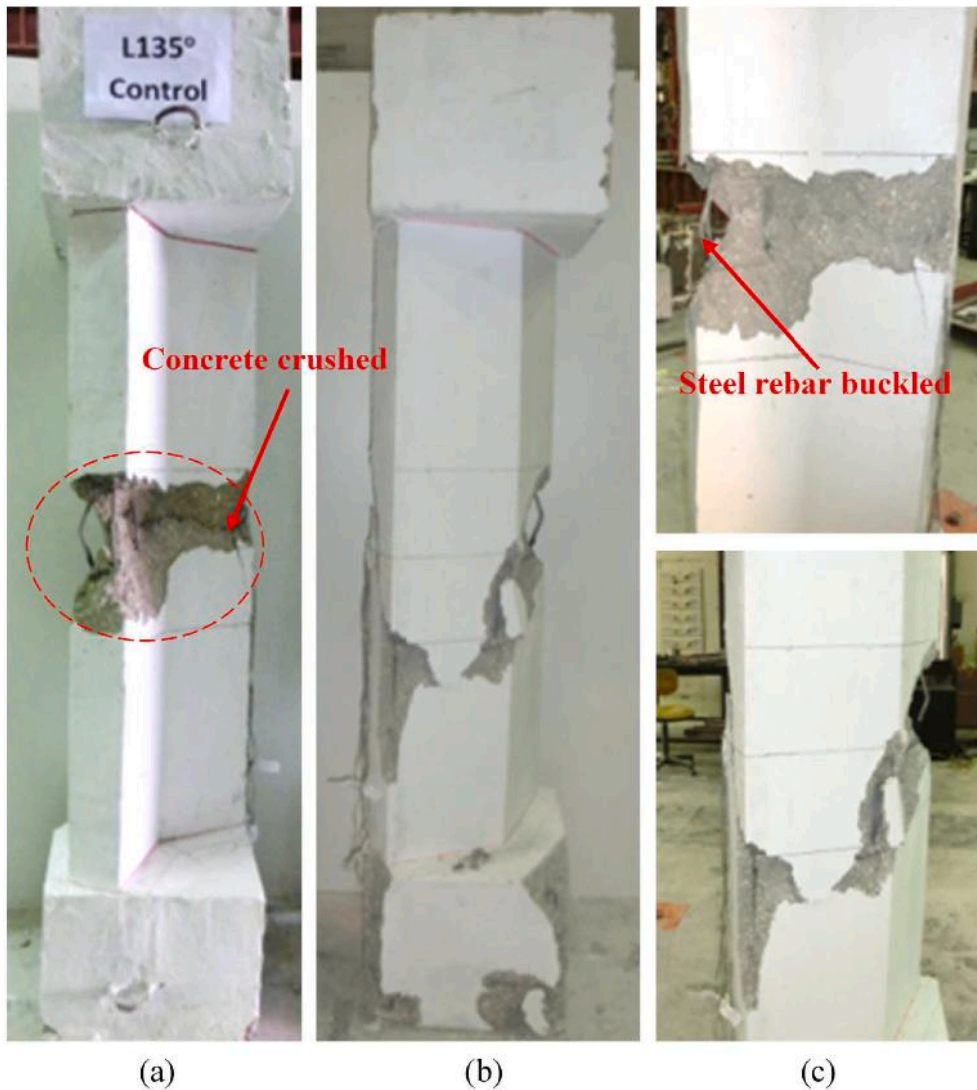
Failure of unstrengthened L135 column: (a) Elevation view; (b) Rear view; (c) Close view.
